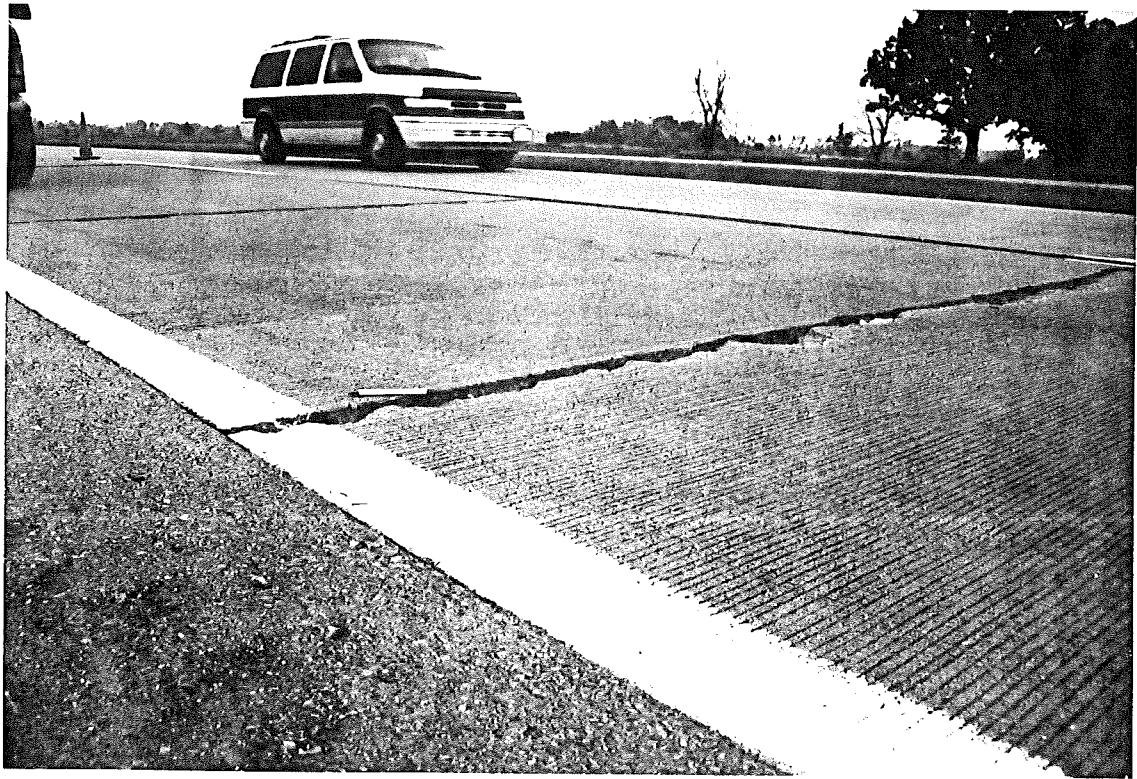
A severely spalled and faulted transverse crack in CSN# 77024-20821A (Section A), EB.
